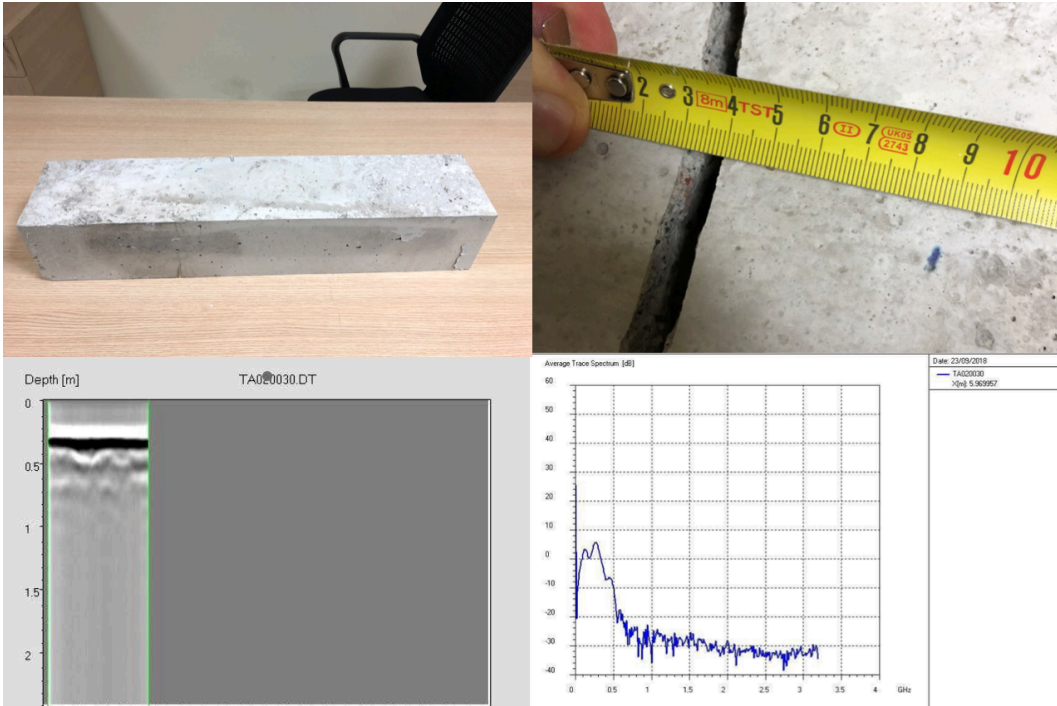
Concrete slab with 1cm crack, B-scan and average trace spectrum
